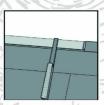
Last row (and perhaps also first row). The Minimum width of the last plank should be NOT LESS than 50 mm. Remember distance to wall is 12-15 mm. Tip! Put a spacer before measuring Cut the planks lengthwise and glue the short ends. See instructions below.
